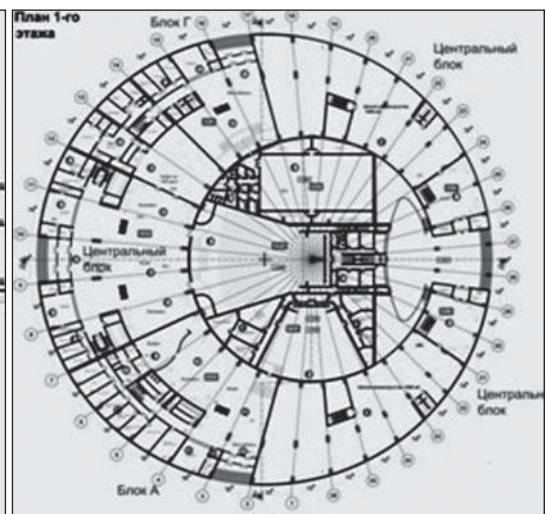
Ground floor plan of “Shabyt” Palace of Arts
